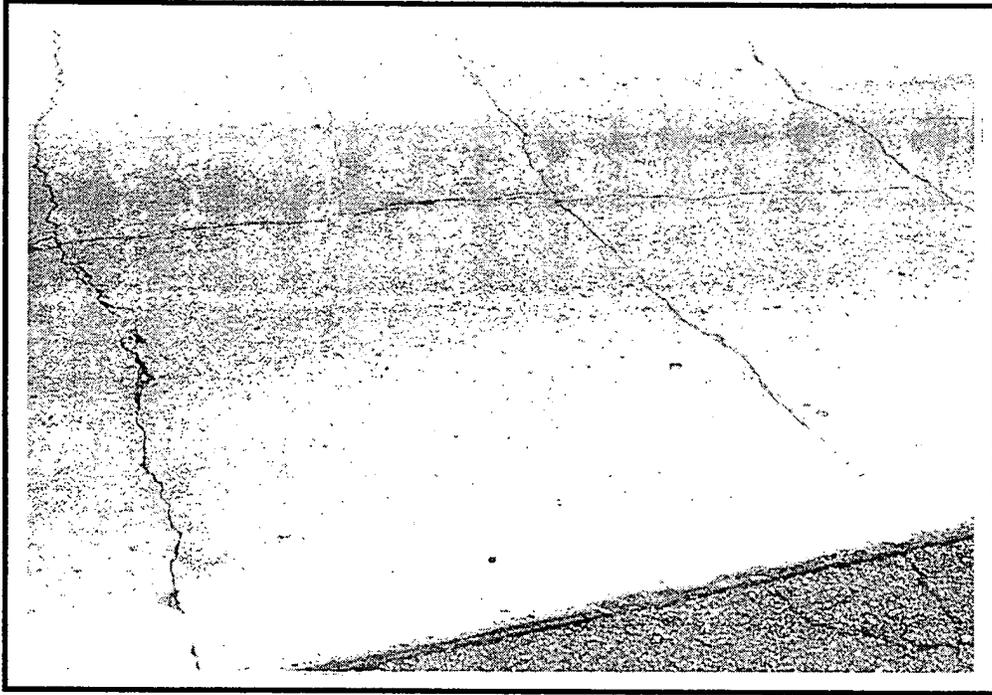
Punchouts in CRC Pavement, Medium Severity
